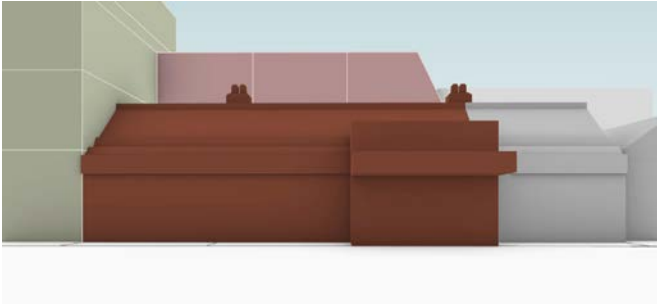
VIEW 1 - Looking north at the subject sites from the southern footpath on Swan Street.
